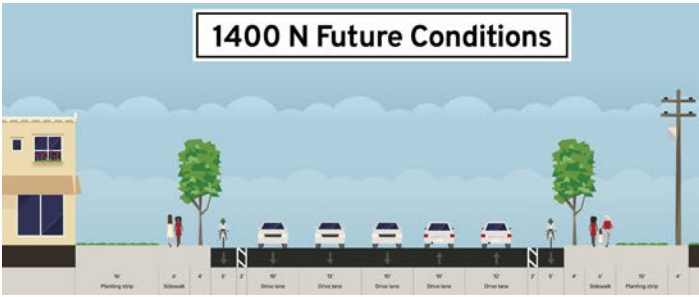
1400 North Proposed Street Section from the City's Transportation Master Plan
